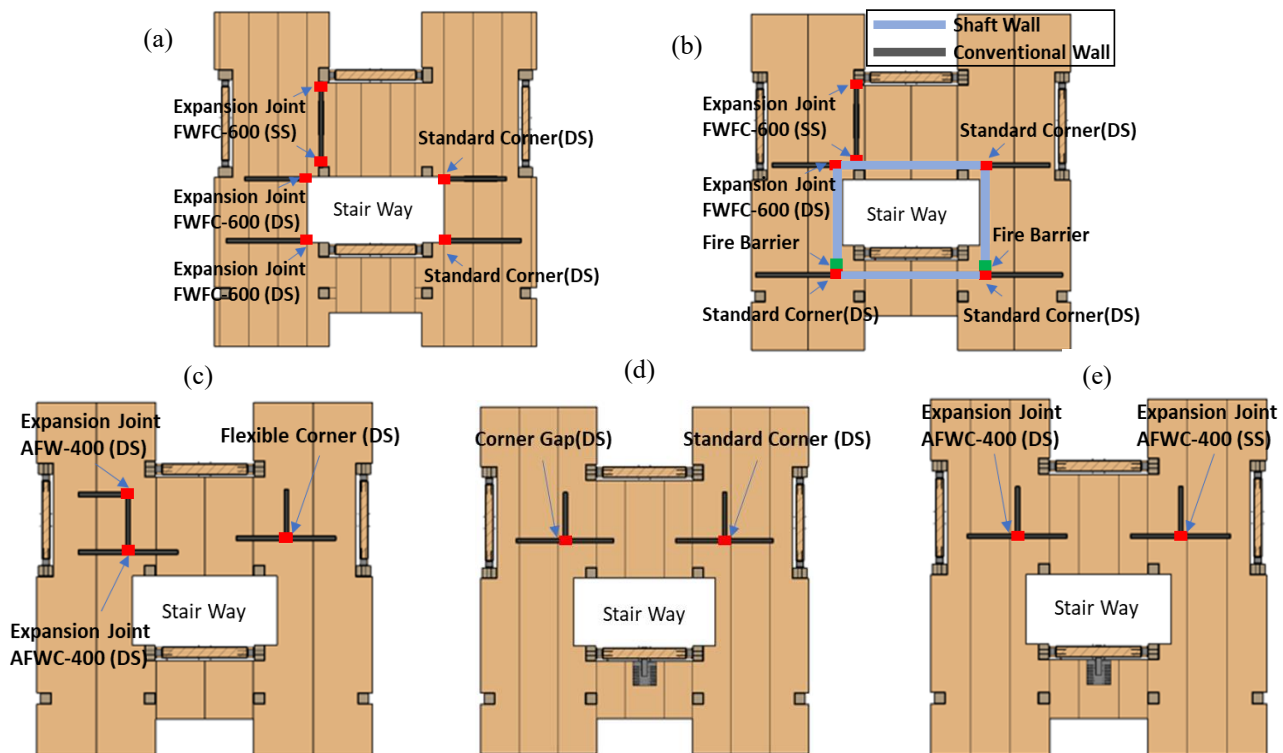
Interior walls plans: (a) story 5 residential floor plan, (b) story 6 residential floor plan with shaft walls; (c)-(e) isolated walls on stories 7-9, respectively; DS = double slip and SS = slotted slip.
